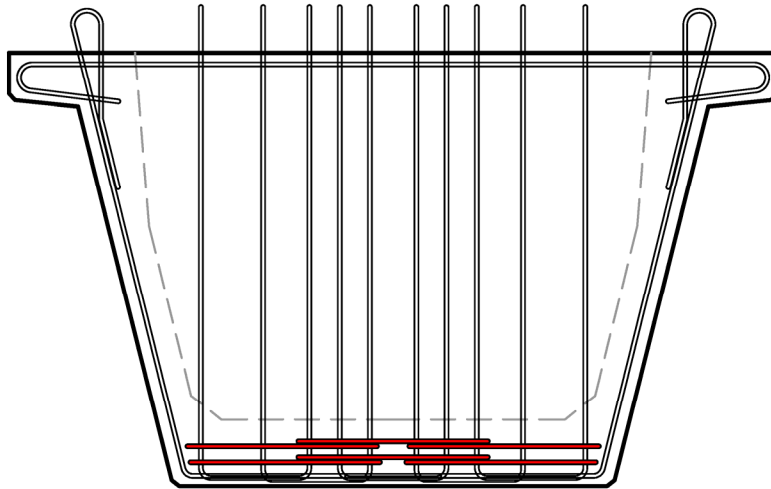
Confining reinforcement provided at end of beams with both details shown in Figure 2.44
